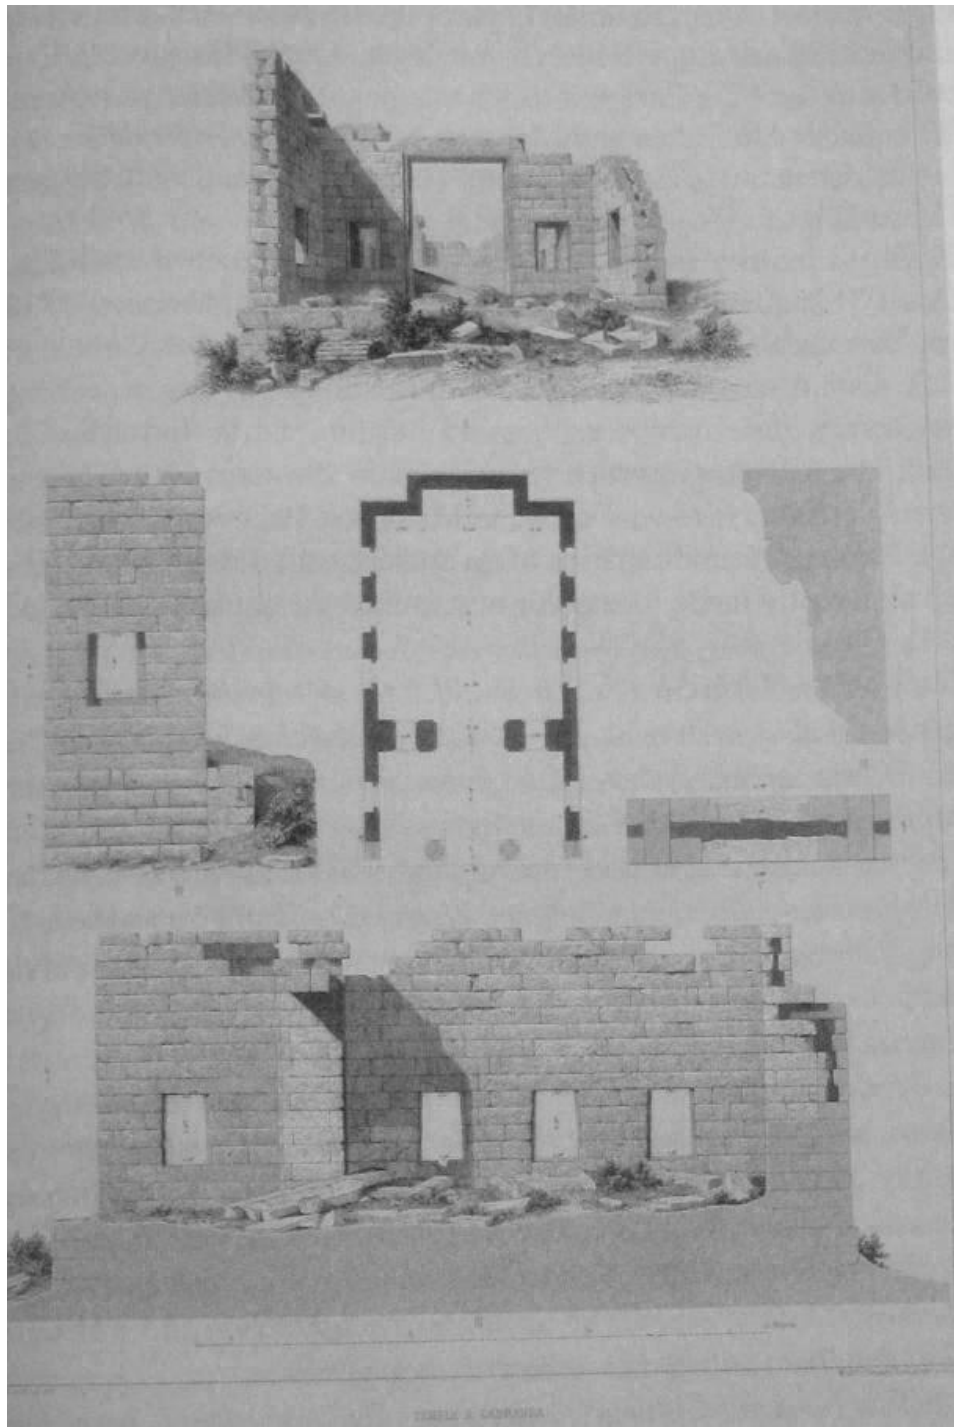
Section and Plan Drawings of Andron A at Labraunda
